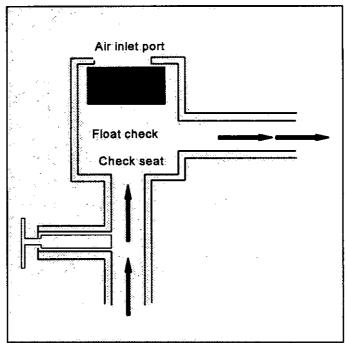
Typical air-vacuum check valve. Mueller, Jerome F. Plumbing Design and Installation Details. Mc Graw-Hill, 1987.
